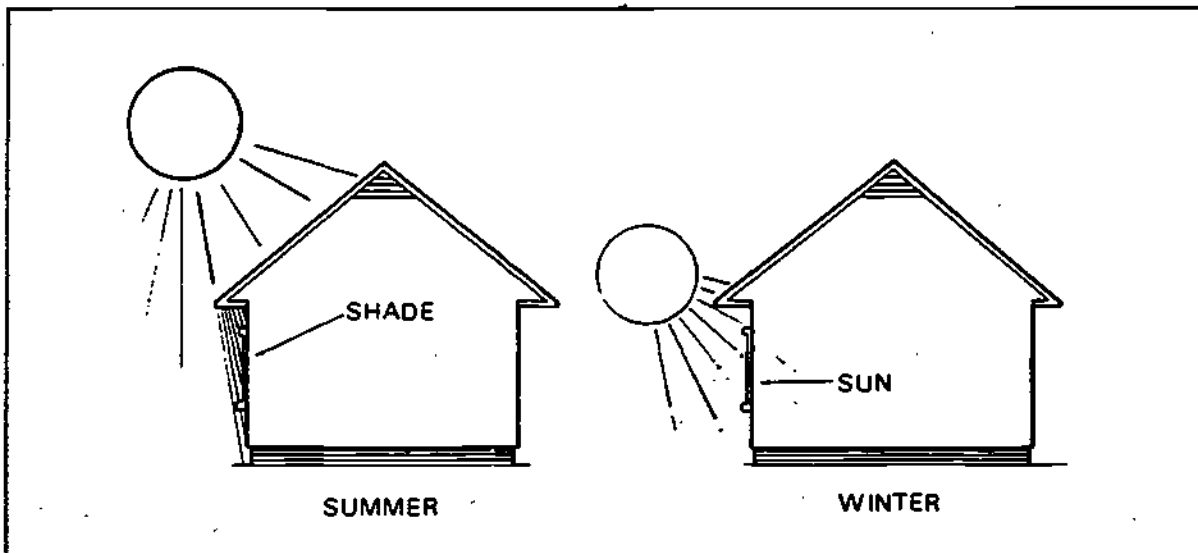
Windows should be exposed to sun in winter and should be shaded during summer.
